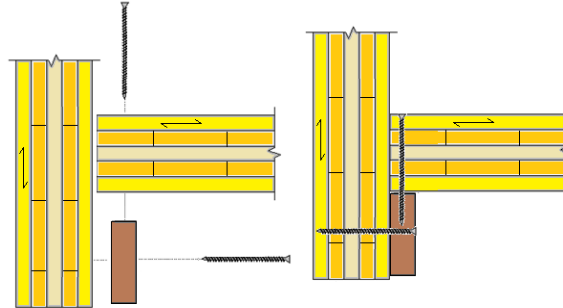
Beam and screws solution for wall-to-floor connection.
